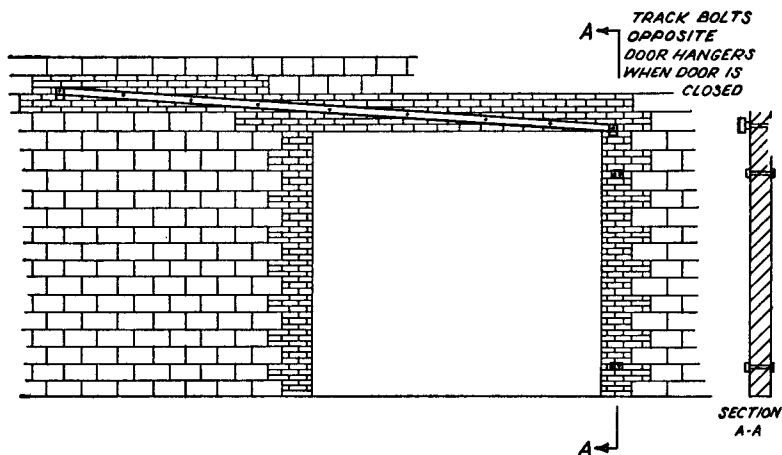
Concrete block wall prepared for a single tinclad or sheet metal slide door, standard method.
